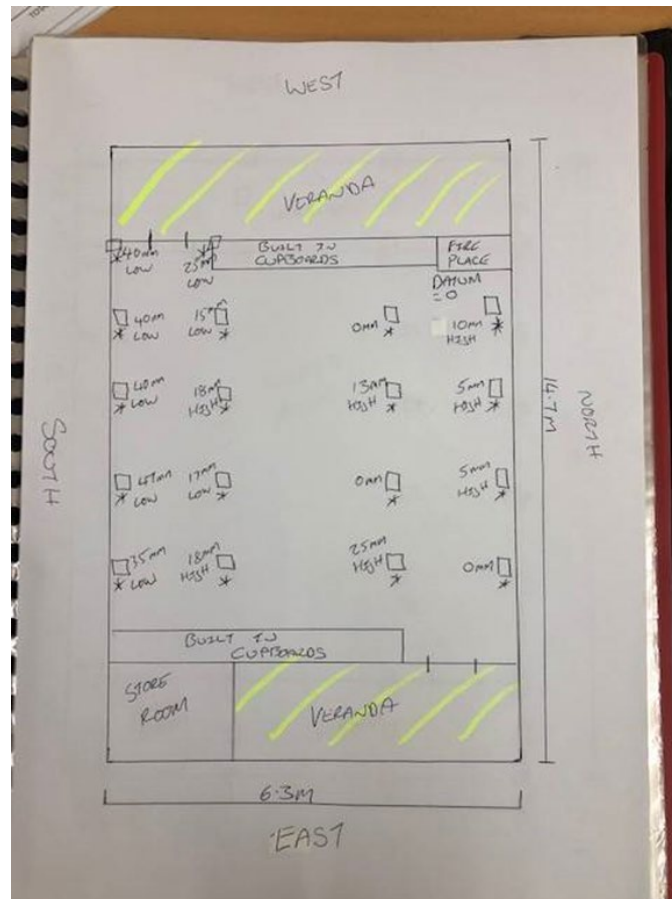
measurement of levels from North West corner of the building (datum point)
